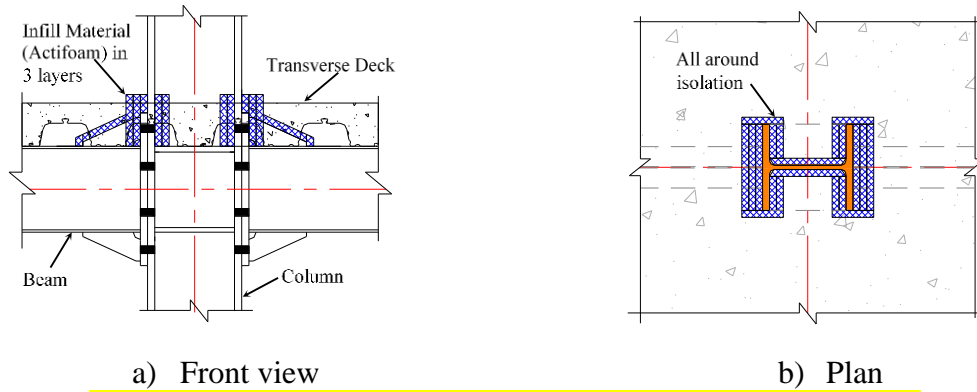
Fully Isolated Slab Unit (FI-SU) Test Sub-Assembly
